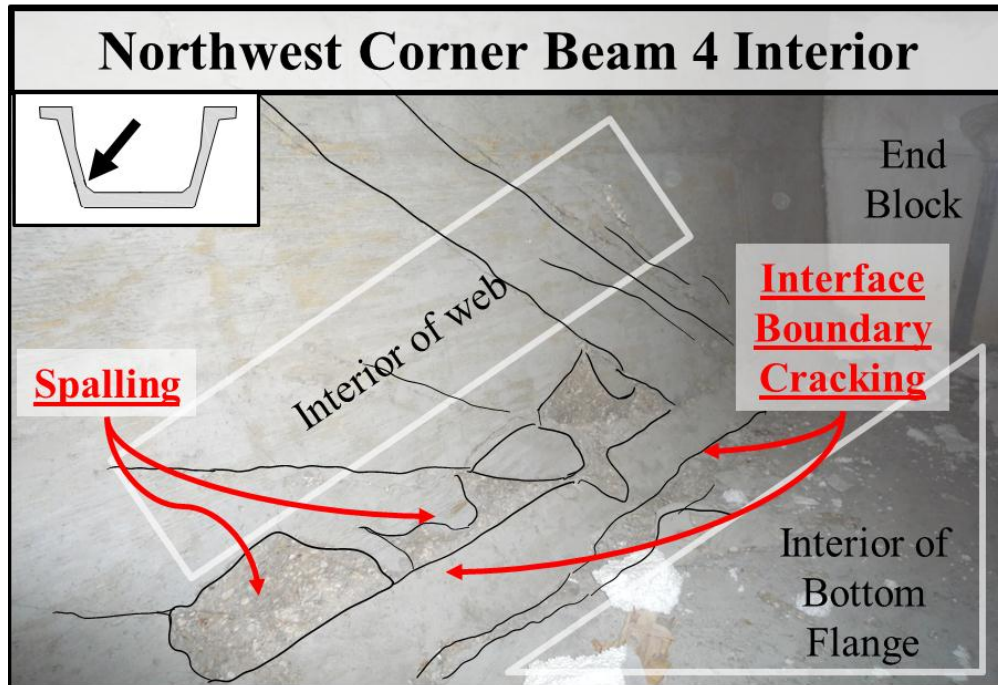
Interior of Beam 4 Showing Web-to-Flange Interface Failure
